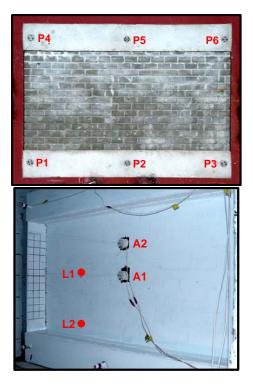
¹/₄-Scale dynamic wall instrumentation plan.
